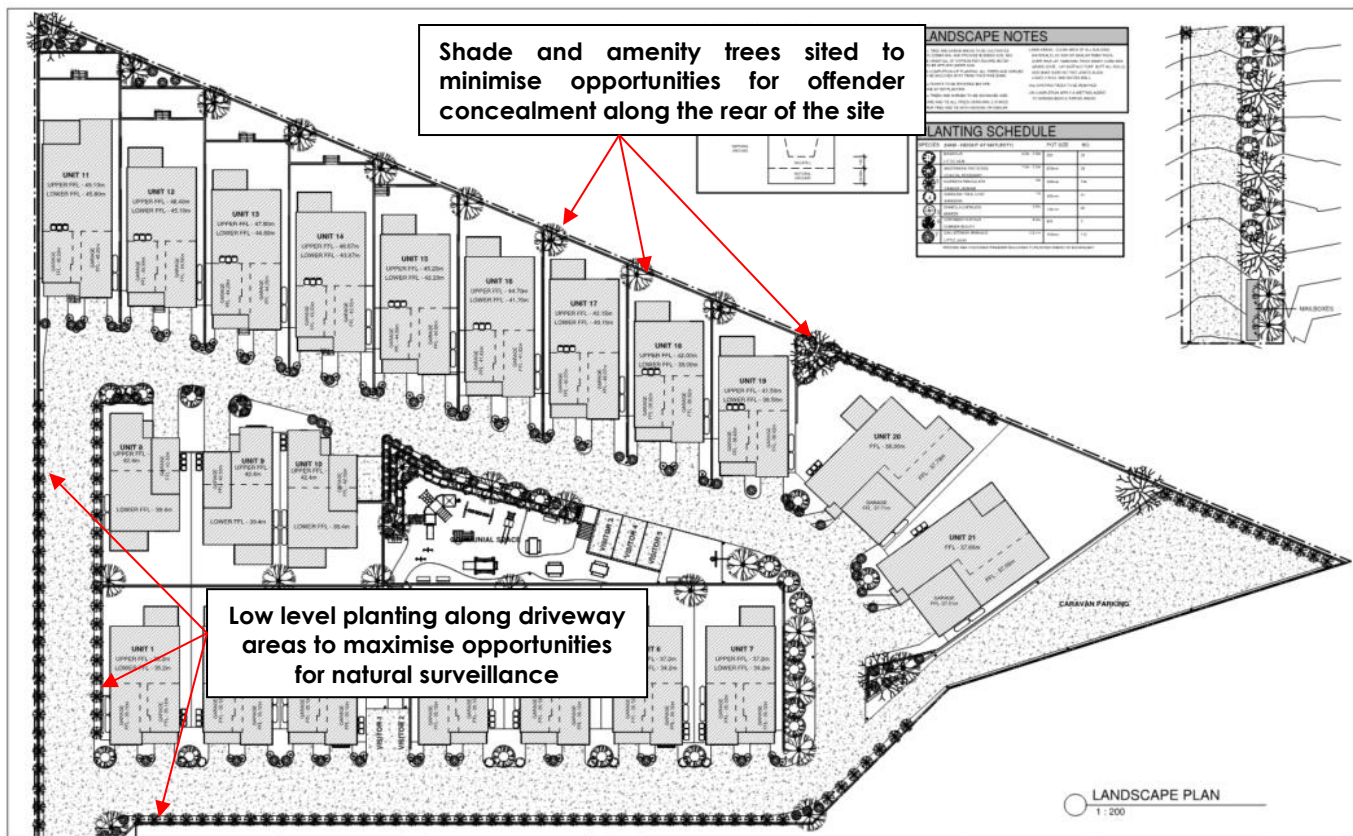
Extract from Landscape Plan (Agcad, 2023)
